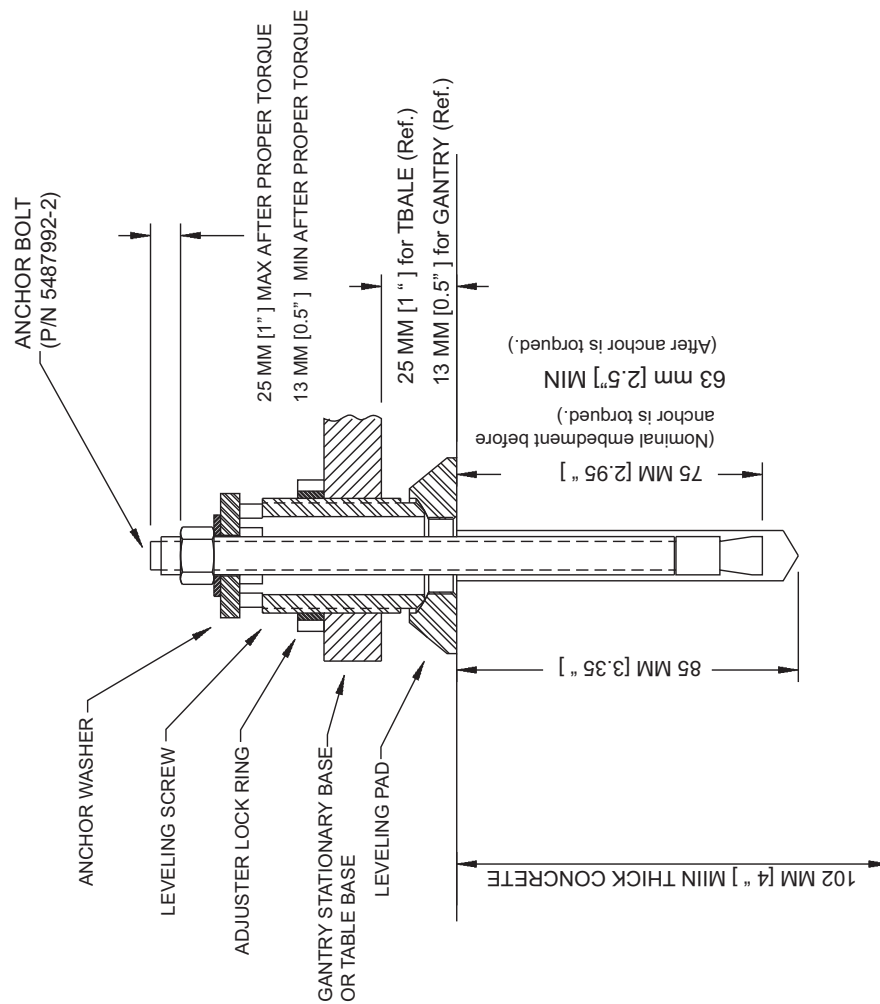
Gantry and Table Anchoring with 5487992-2 (7 in.) Anchor Bolt
